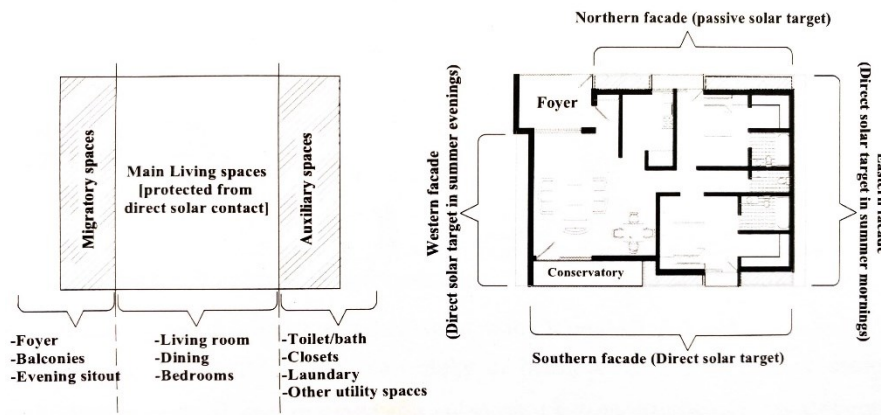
Schematic concept for spatial distribution within an apartment unit adopting the ventilated cavity wall façade system
